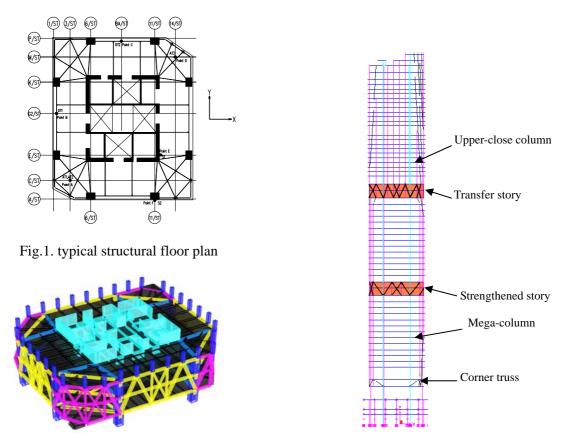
high level transfer story axonometric drawing Fig.3. structural elevation view
